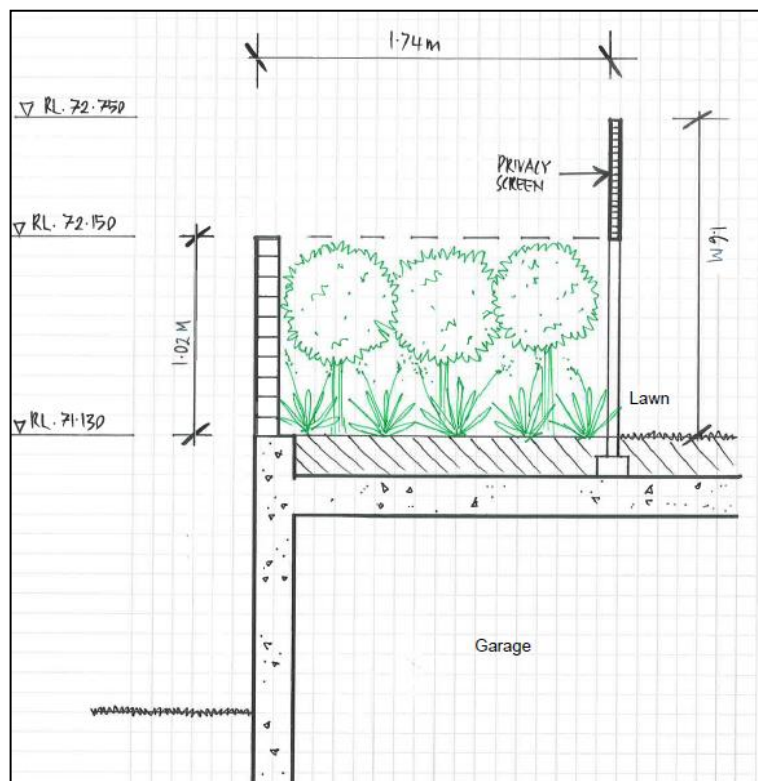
Drawing SK-002 – 2 Barrett Place, Randwick (Source: K Burke, 26/10/2021)
